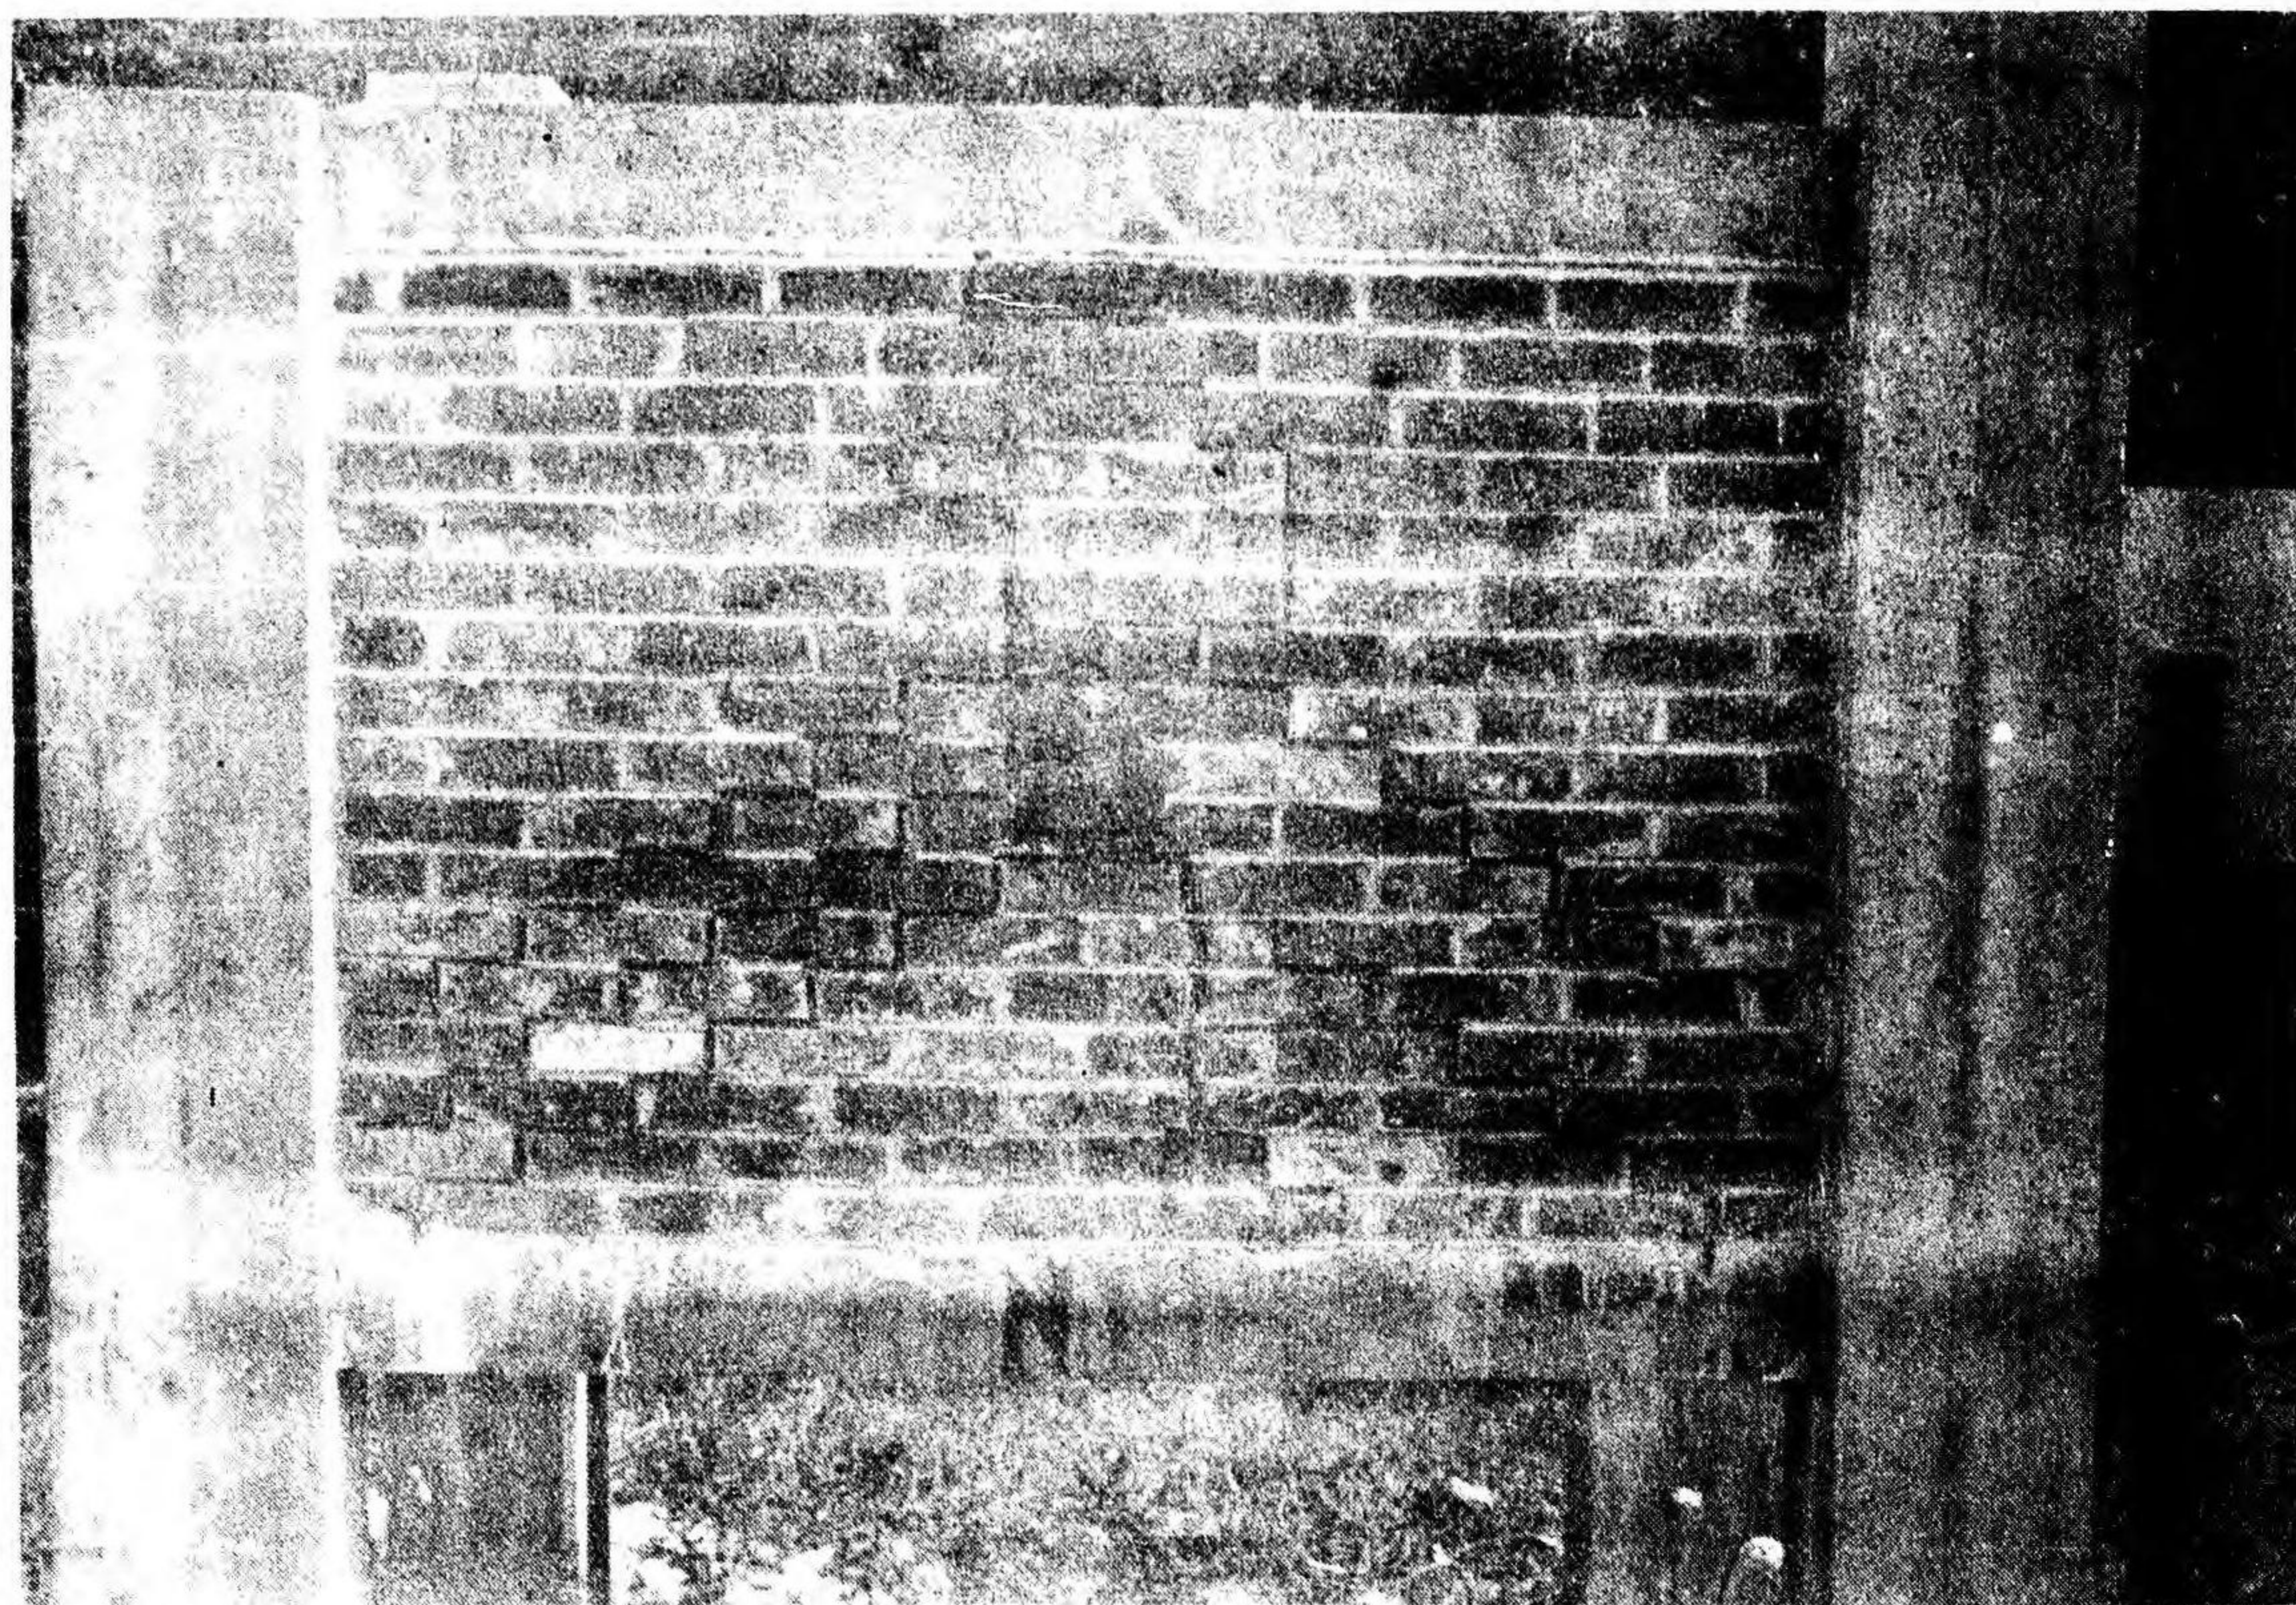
North wall of test structure after detonation of one 22-gm pellet of Tetryl. Cracks have been indicated with crayon markings.
